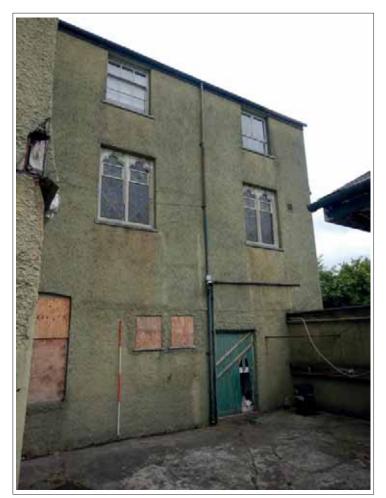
West elevation of south annex, looking south-east. 2m scale.
